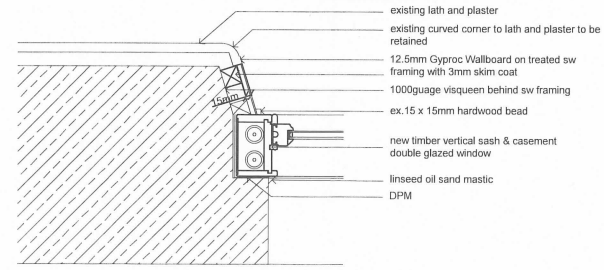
Section Through Typical Window (4 over 4) 1:20
